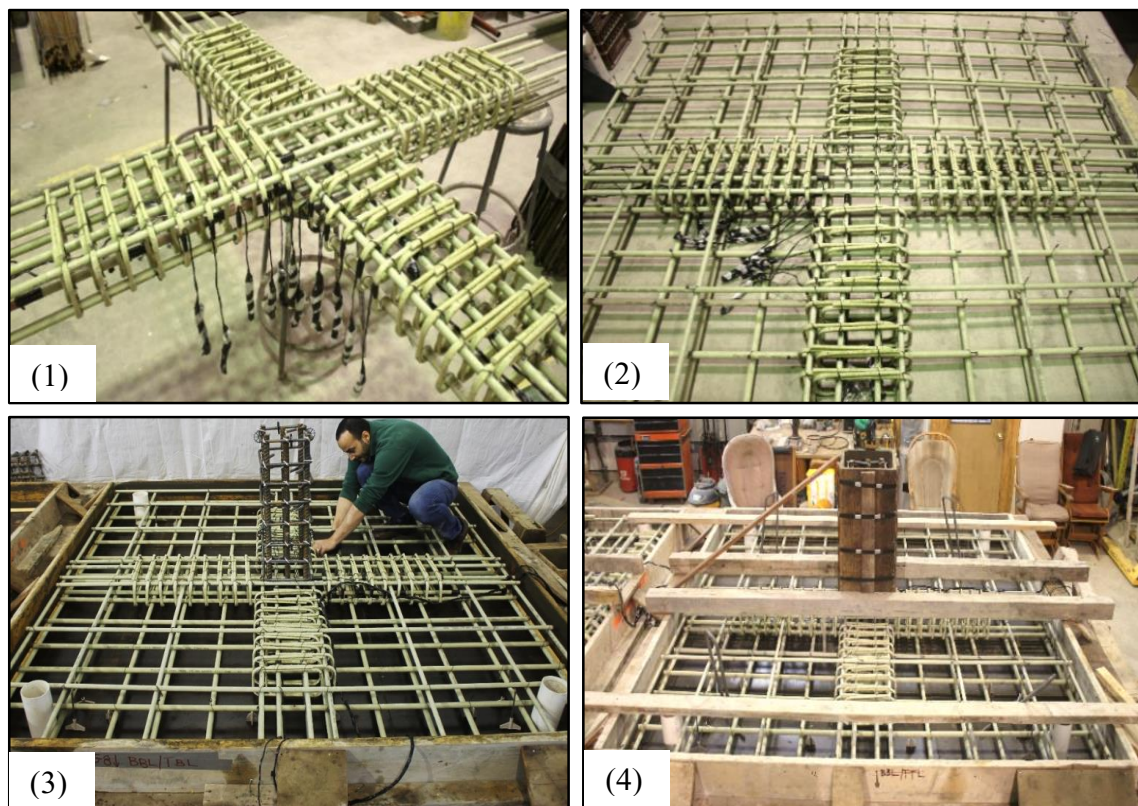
Shuttering and fabrication of specimens with shear reinforcement.
